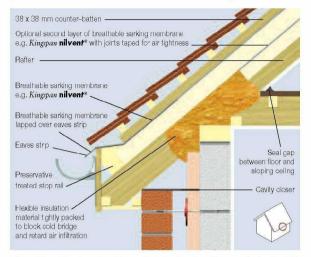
Overhanging Eaves Detail - Section Perpendicular to Ridge
